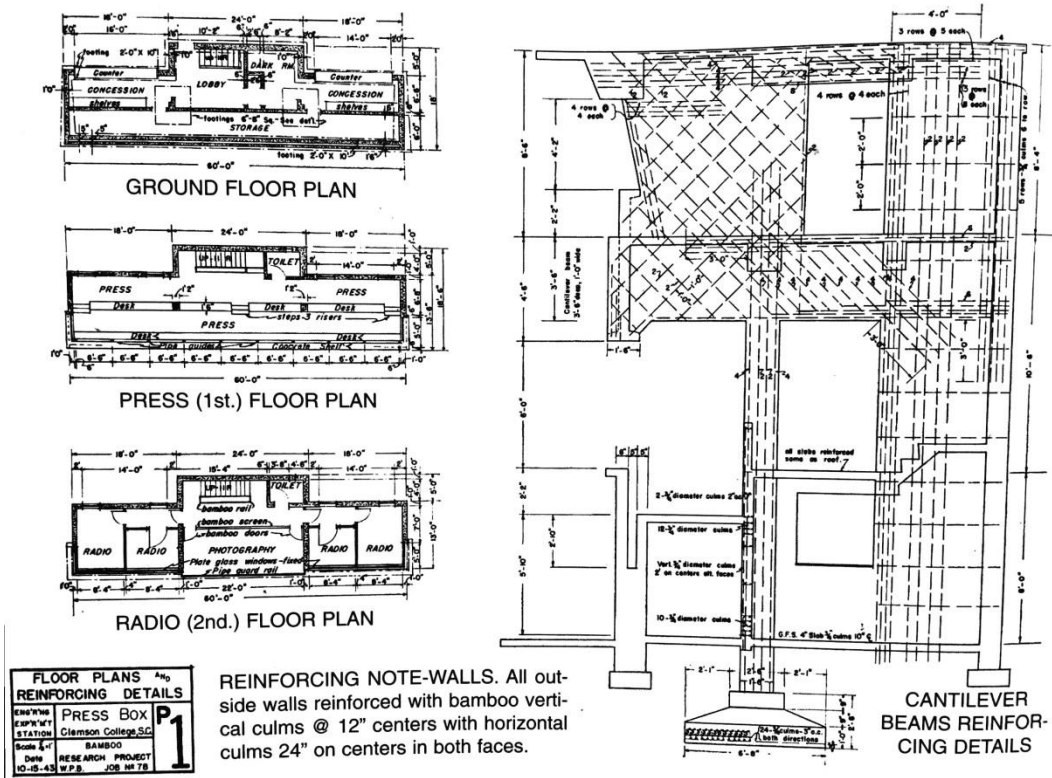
Details of the bamboo reinforcement used for the Press Box Building by Glenn (Hidalgo-Lopez 2003)
